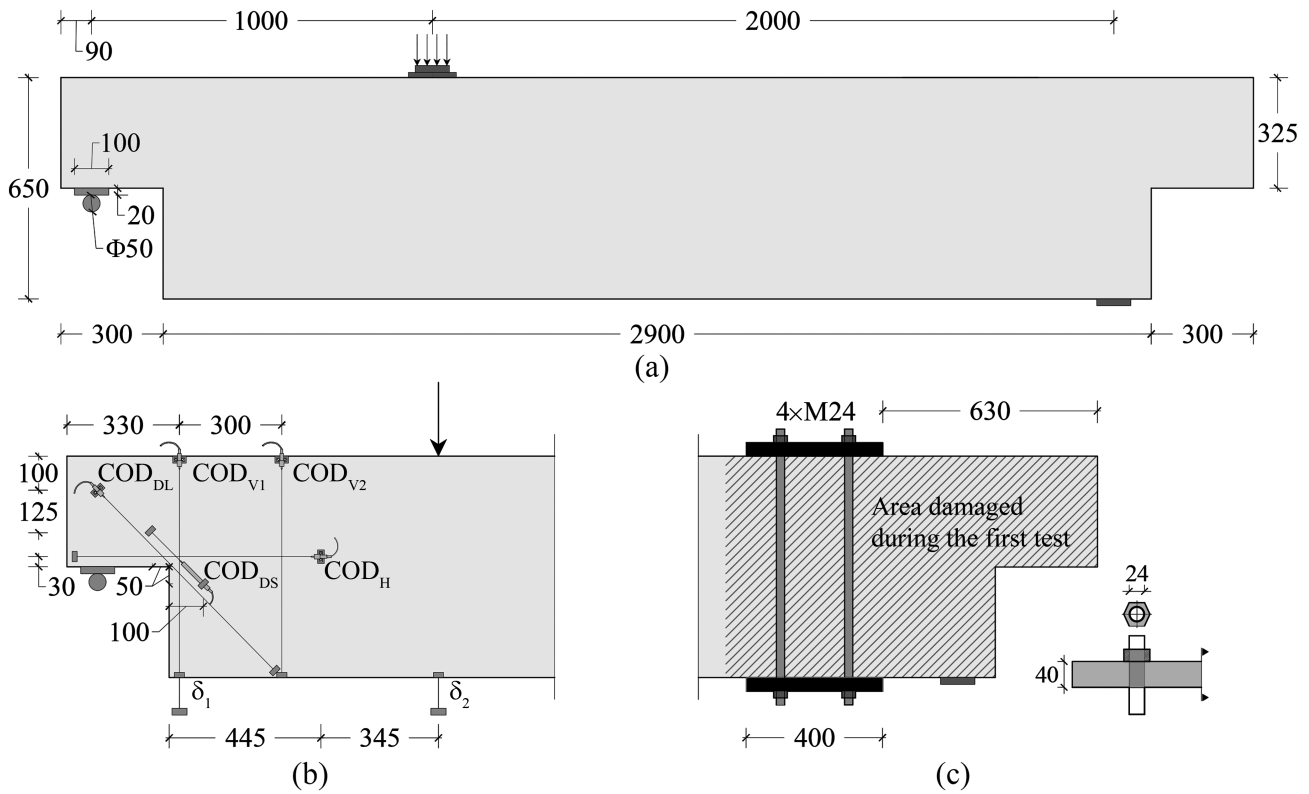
Geometry of specimens and test set-up (a), instruments layout (b), and detail of vertical reinforcing plates used after testing the first dapped-end (c). Measures in mm.
